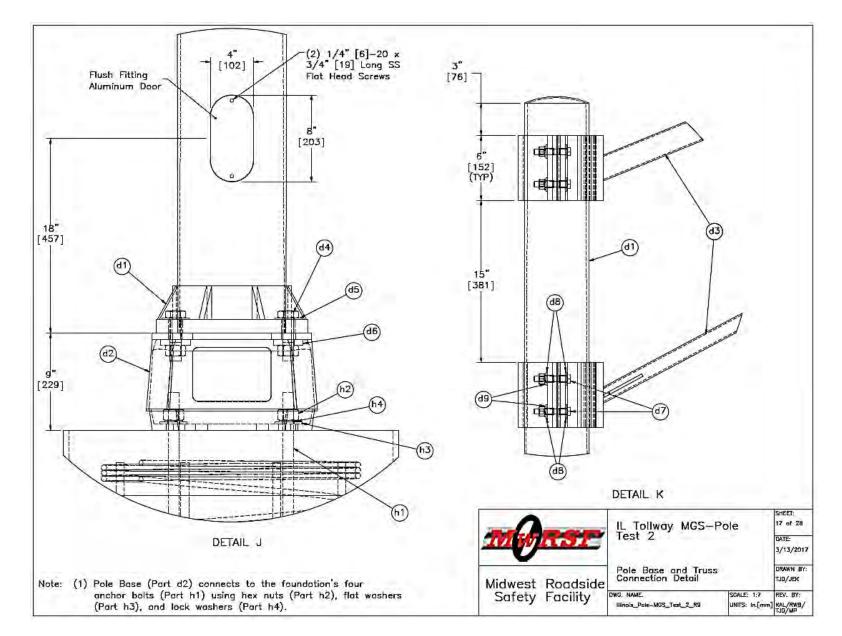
Pole Base and Truss Connection Detail, Test No. ILT-2
